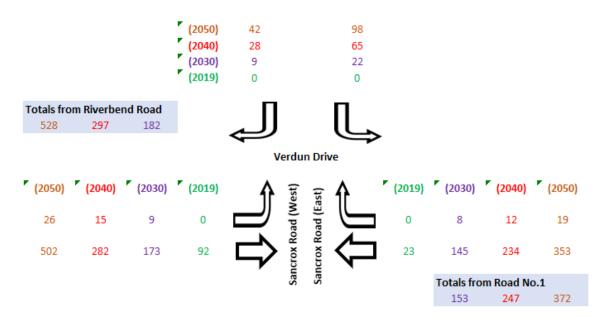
FUTURE TRAFFIC FLOWS – SANCROX ROAD & VERDUN DRIVE INTERSECTION (30 YEAR DESIGN HORIZON)
